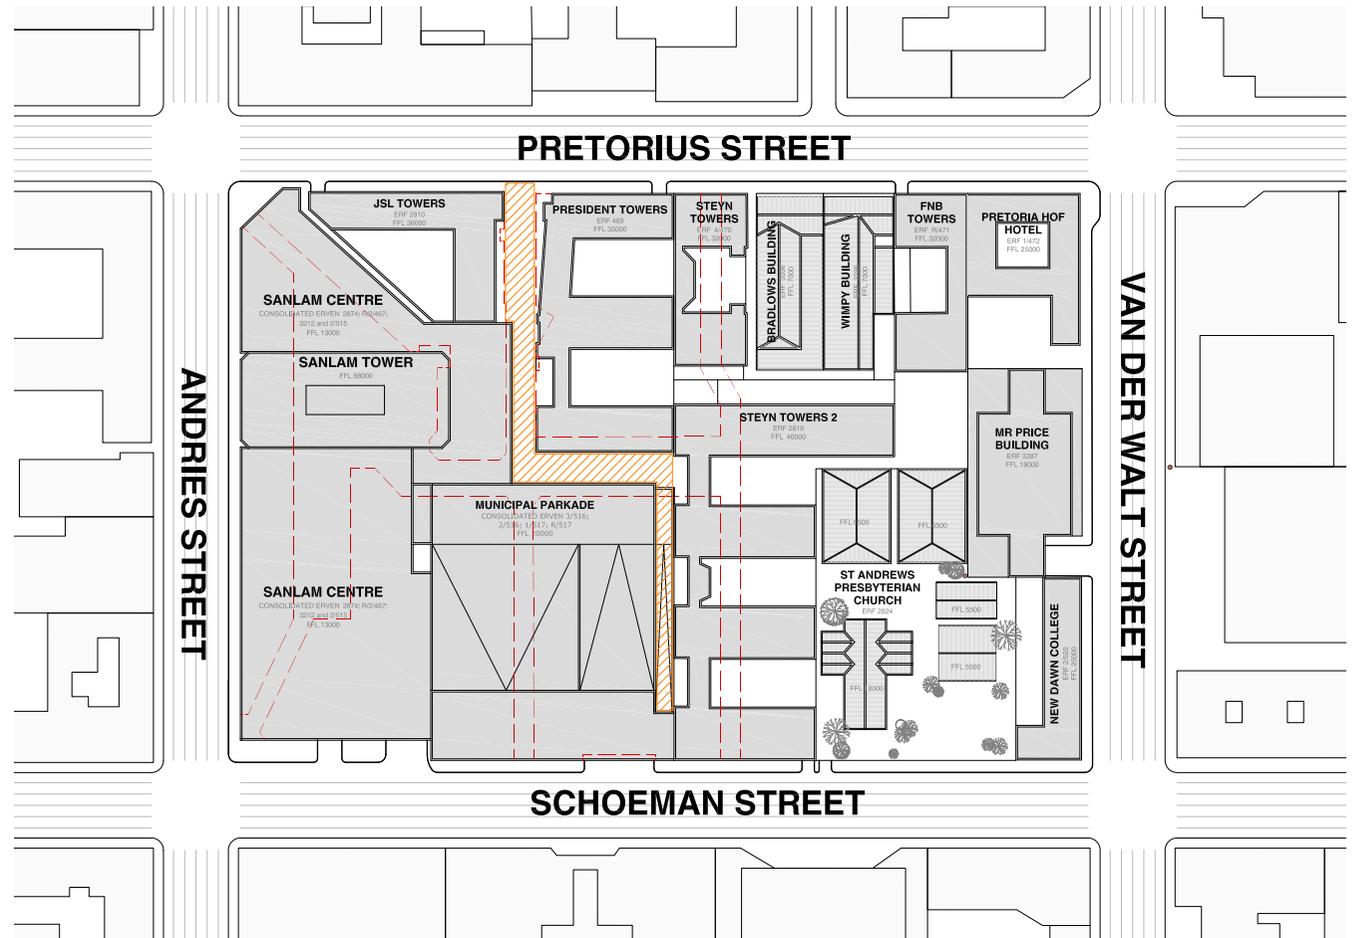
The existing site plan, showing "inbetween space" with the potential to be occupied (Author, 2010).
